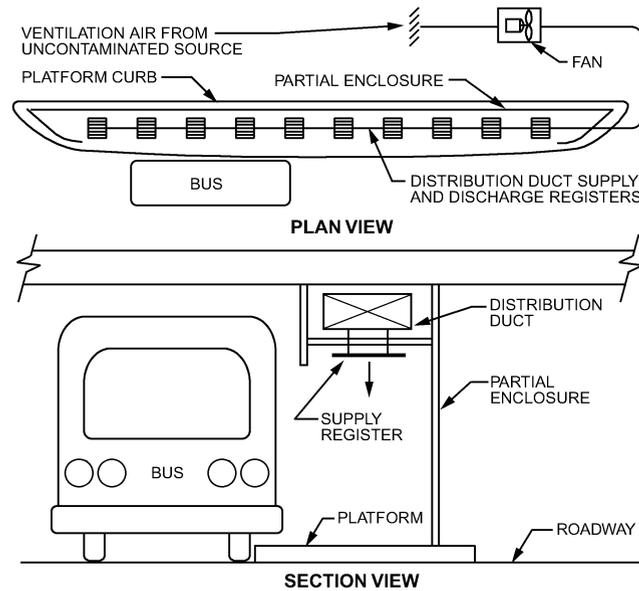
Partially Enclosed Platform, Drive-Through Type
